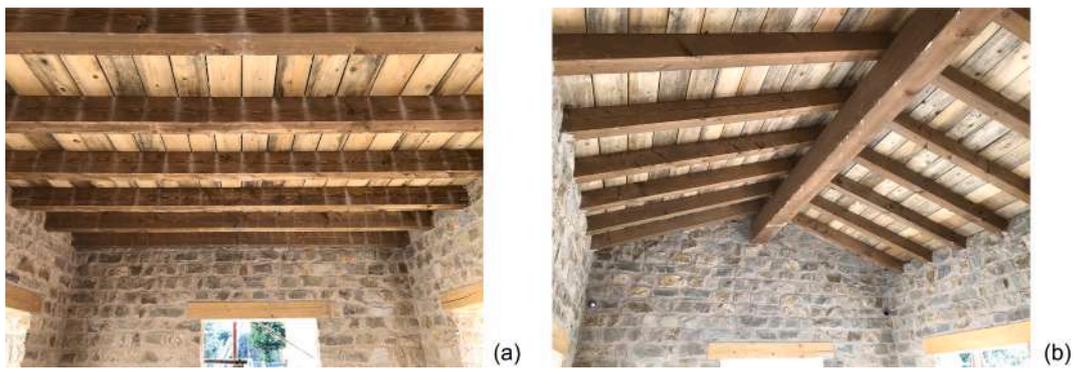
Views of the building from inside: intrados of the intermediate floor (a) and of the roof (b).
